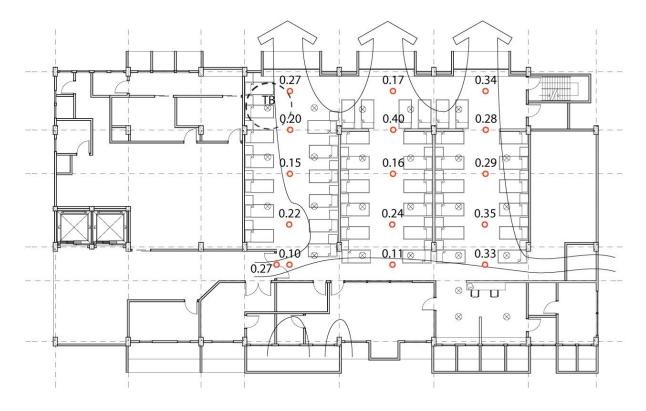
Floor plan and ventilation data of hospital E inpatient ward#4
